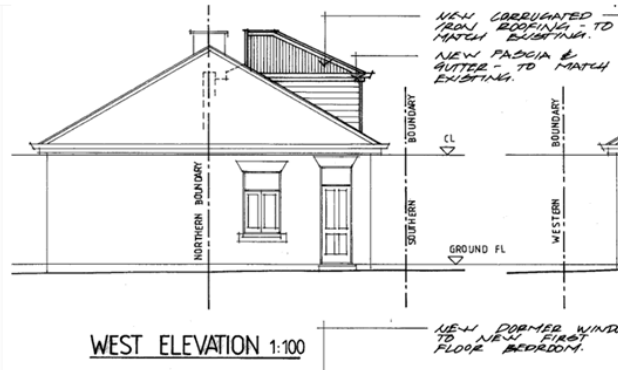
Western (front) elevation of the previously refused application PLN-16-00492.
